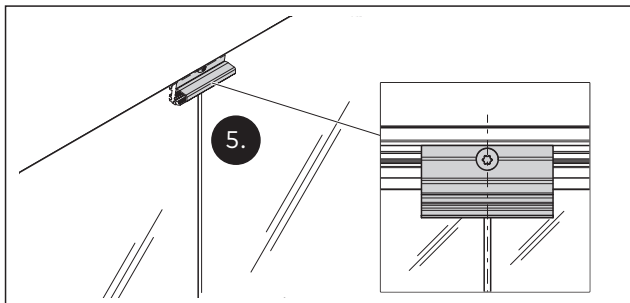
The position of the glass clamping pieces on the joint between the overpanel and a side panel
